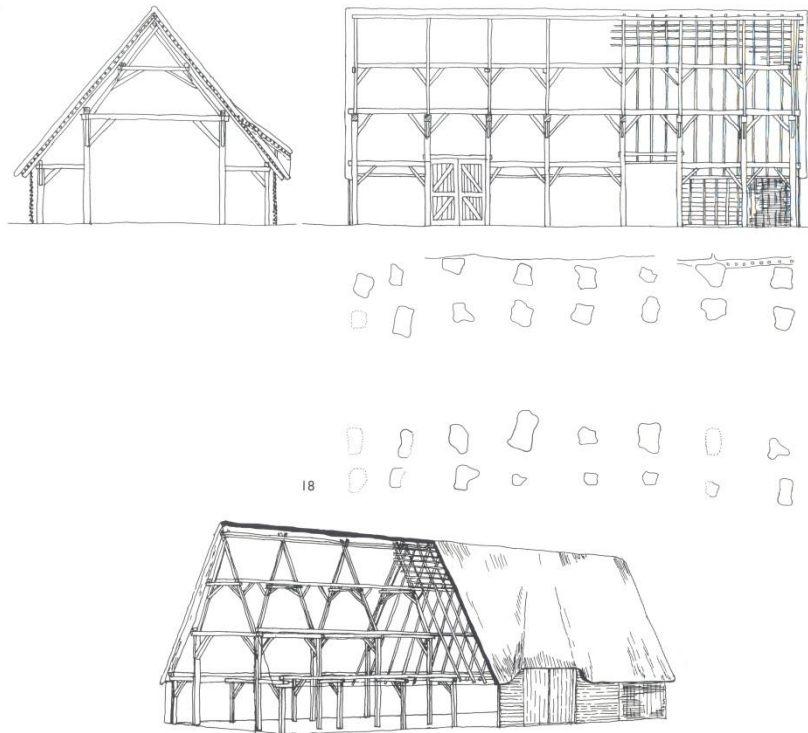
Oost-Souburg type IV building. After Van Heeringen 1995b.
